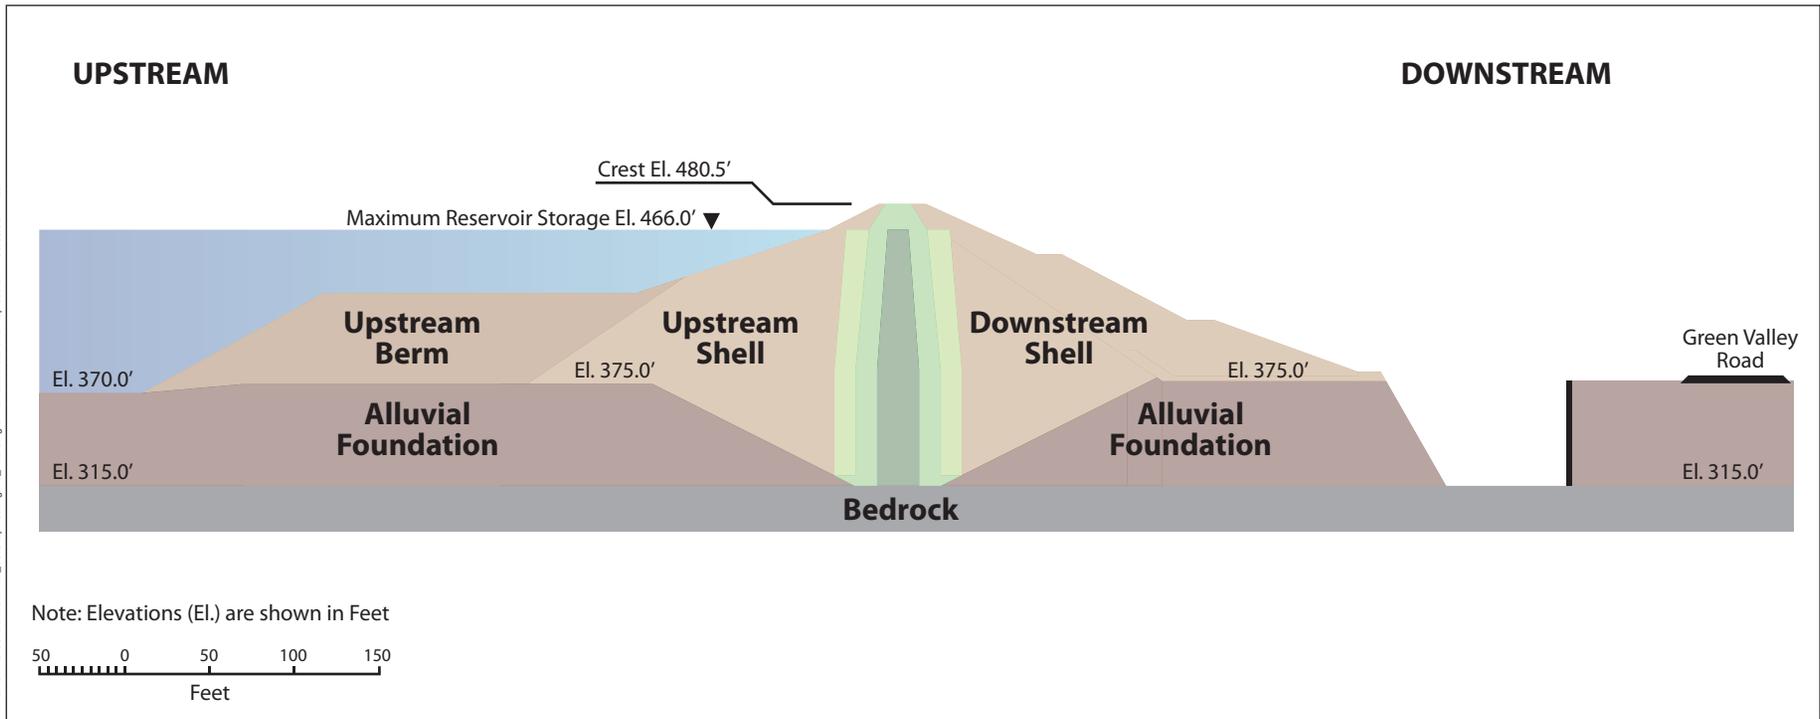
Alternative 2 – Single Wall Excavate and Replace
